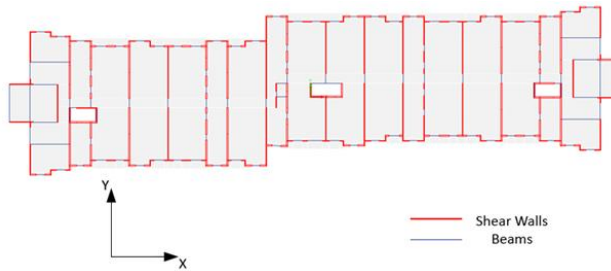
Schematic Plan View of Building A (Combined Rectangular Building)
